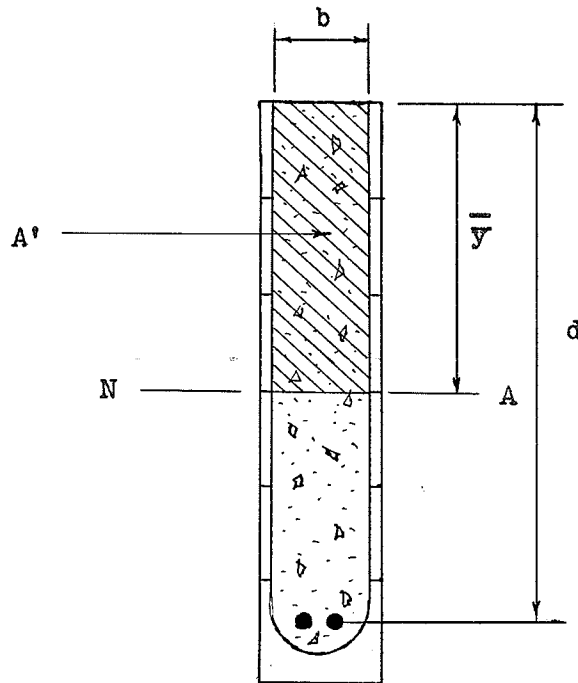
CROSS SECTION OF BEAM THROUGH CONCRETE CORE
